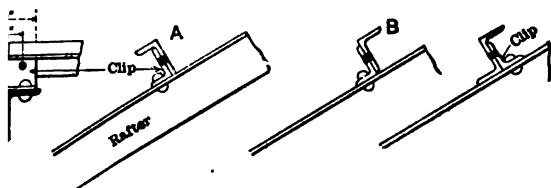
Purlin-connections. Steel Clips, Angles and Z Bars
